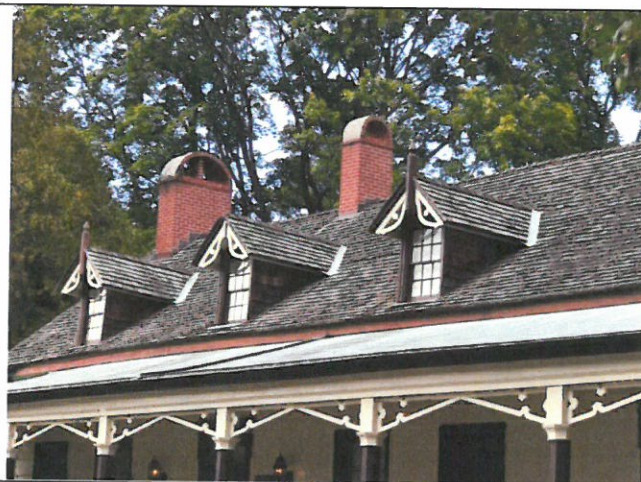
Dormers D6, D5, D4; Chimneys D2 and D1.
